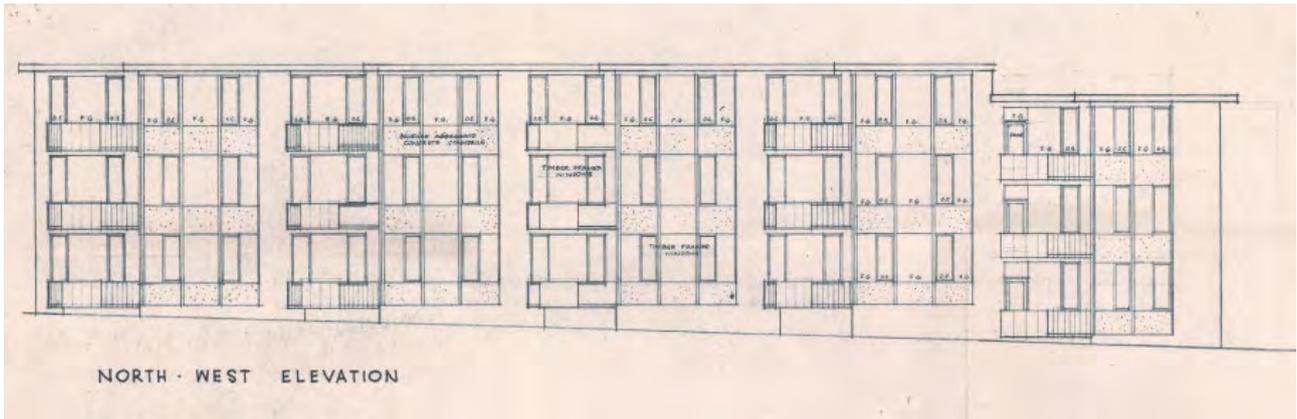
1968 drawing showing the north-west or garden side elevation (Source: BP)
